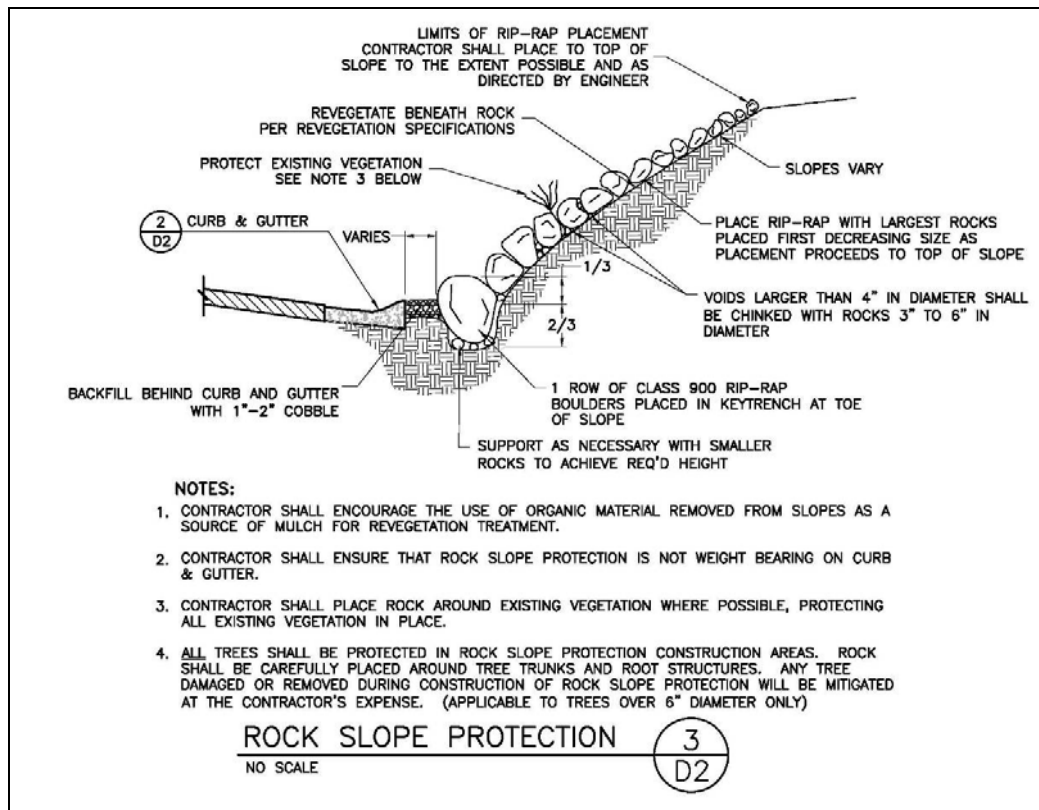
Rock Slope Protection (RSP) Detail from Nichols Consulting Engineers
